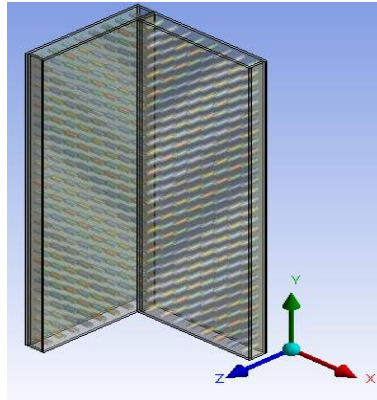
Geometry of L- shaped stainless-steel core plate wall.
